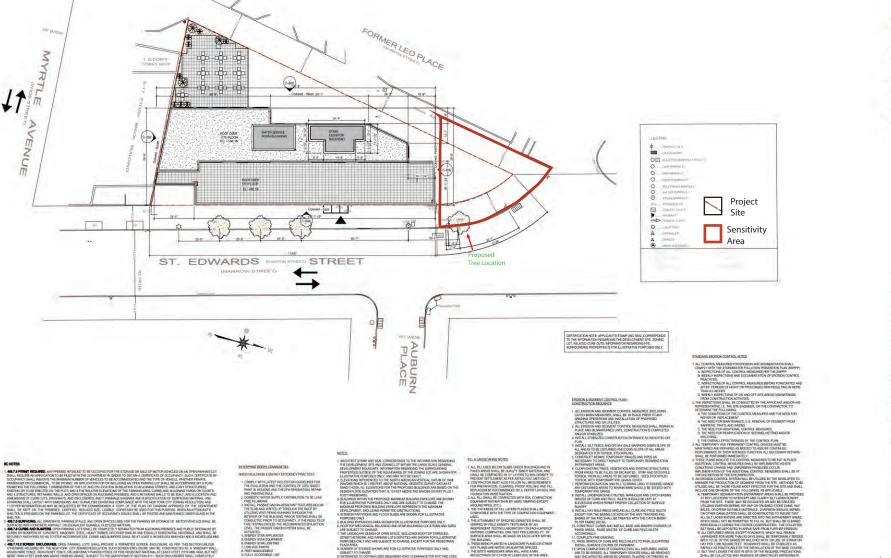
Proposed project site plan (Aufgang Architects 2019; HPI 2025).
